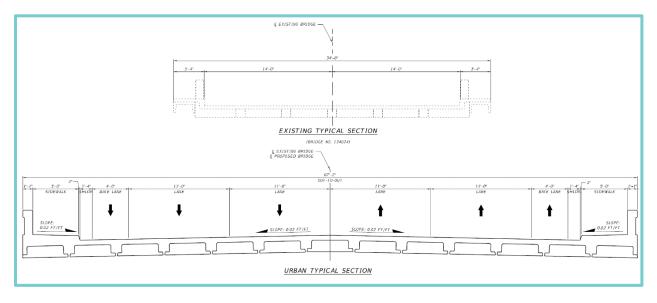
Detoured Construction Alternative (Urban Typical Section)
